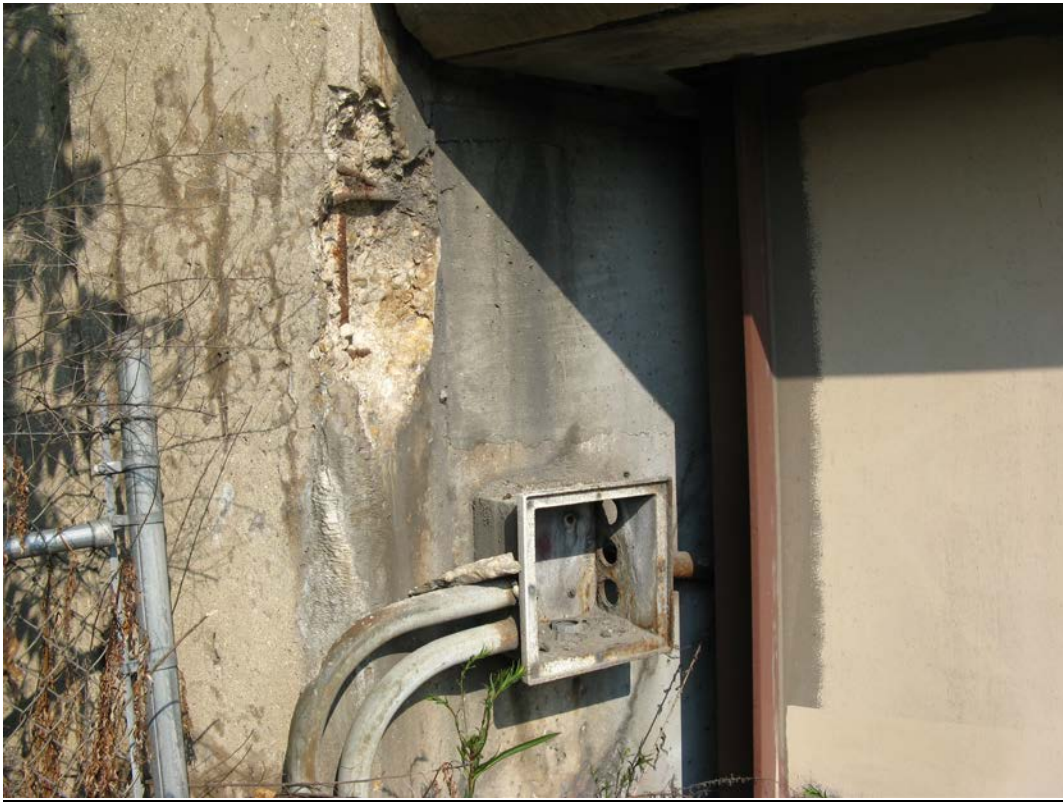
Spall on front face of West Abutment backwall at south end and open conduit junction box, looking north
